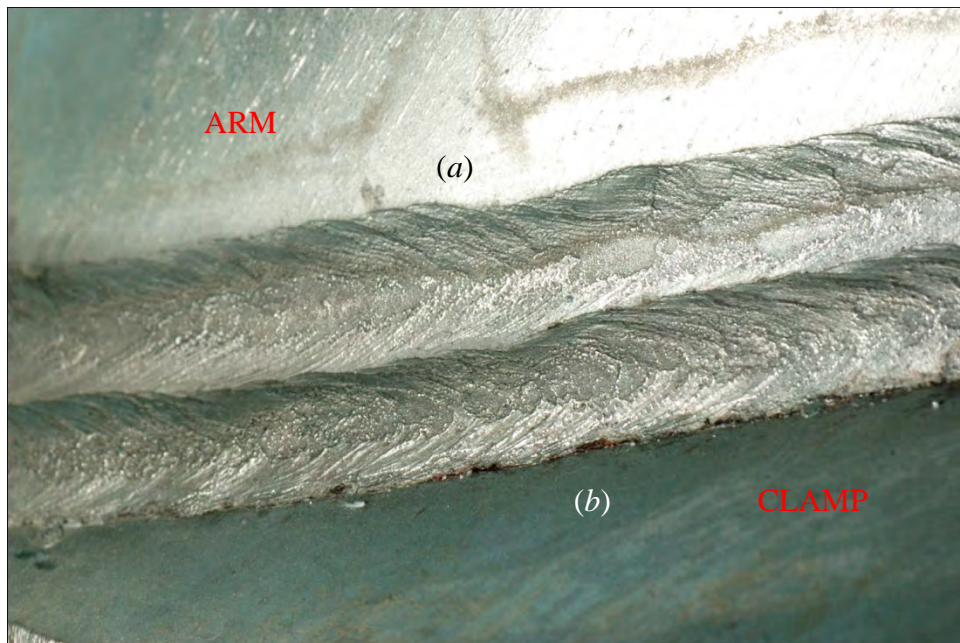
Close-up of weld toe at arm-to-clamp connection in specimen Type V: (a) weld toe on the arm; and (b) cracked weld toe on the clamp
